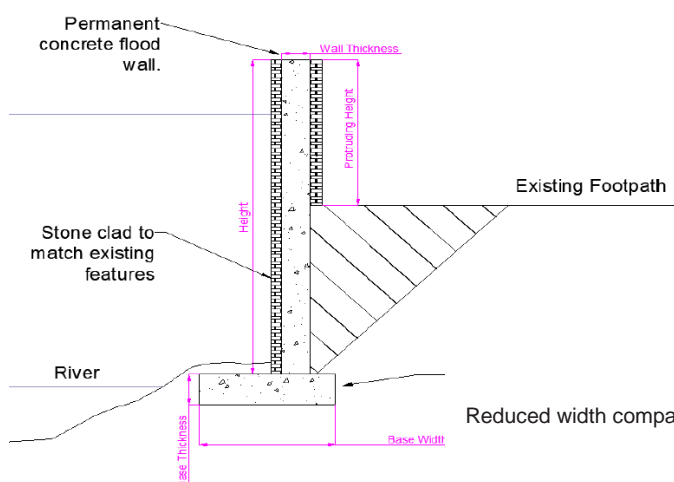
Sketch In situ Reinforced Concrete 'L' Shaped Flood Wall
